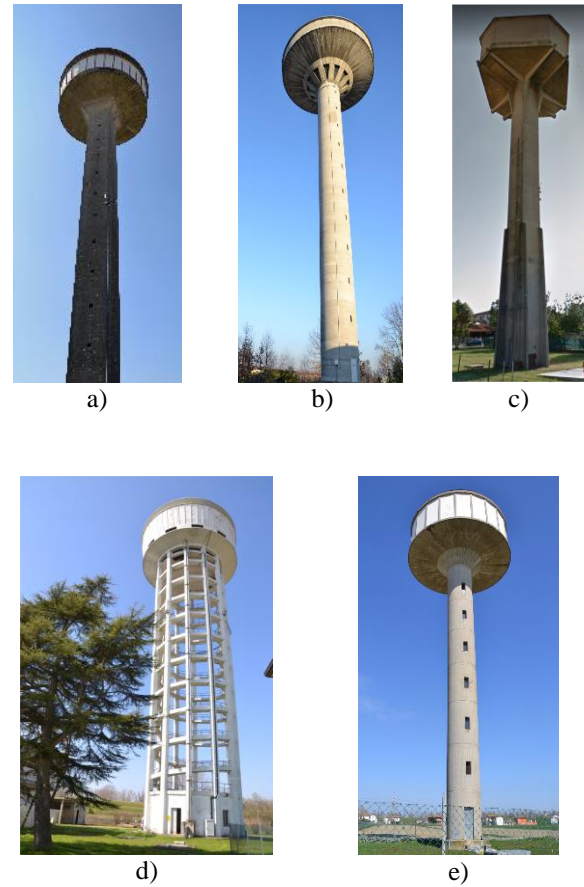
Water elevated tanks considered, located in a) Ariano nel Polesine – Rivà, b) Castelnovo Bariano – Centrale, c) Occhiobello – S. M. Maddalena, d) Corbola – Centrale, e) Taglio di Po – Polesinello
